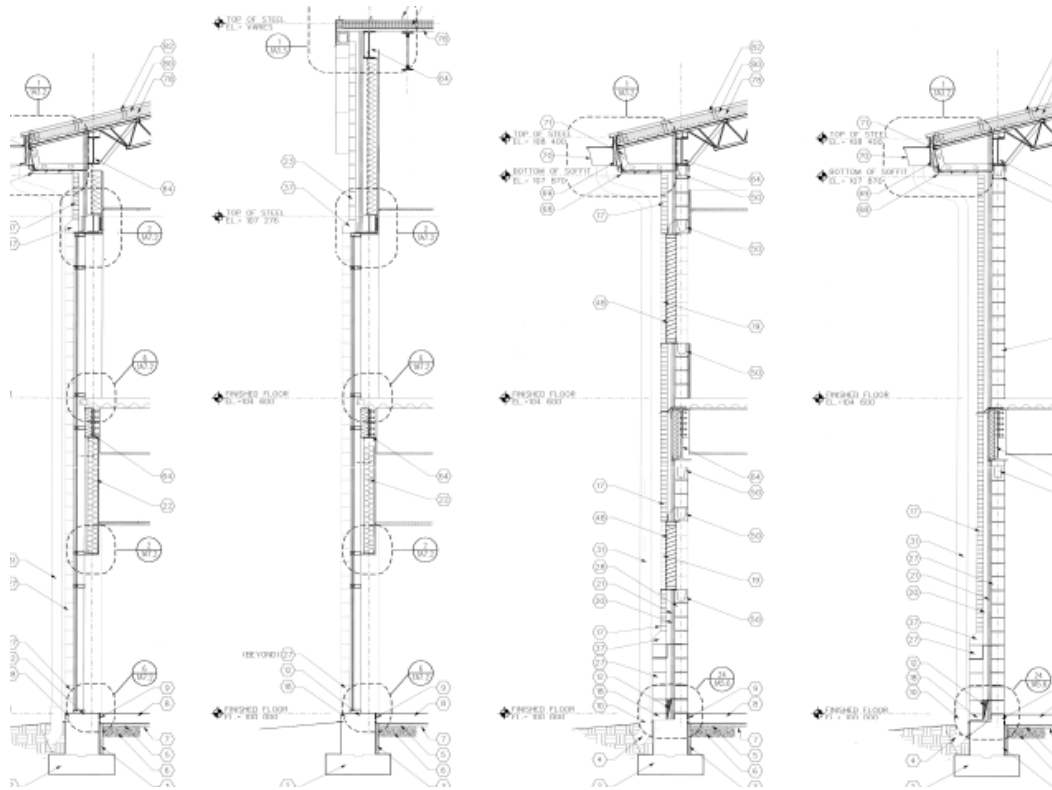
Army Reserve Center wall sections, Bldg 3450, Fort Carson, CO.
